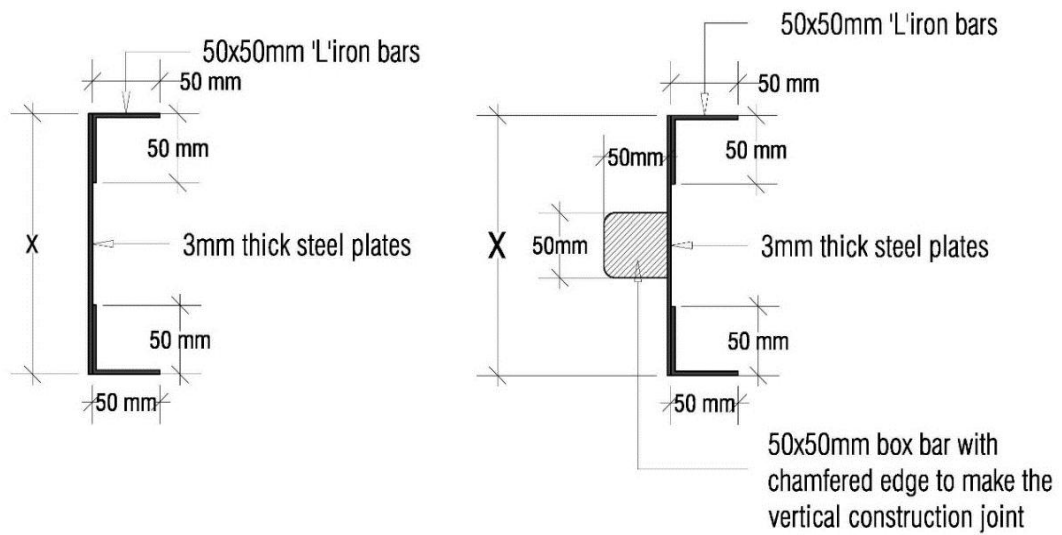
Formwork arrangement of end plates – PLAN VIEW
